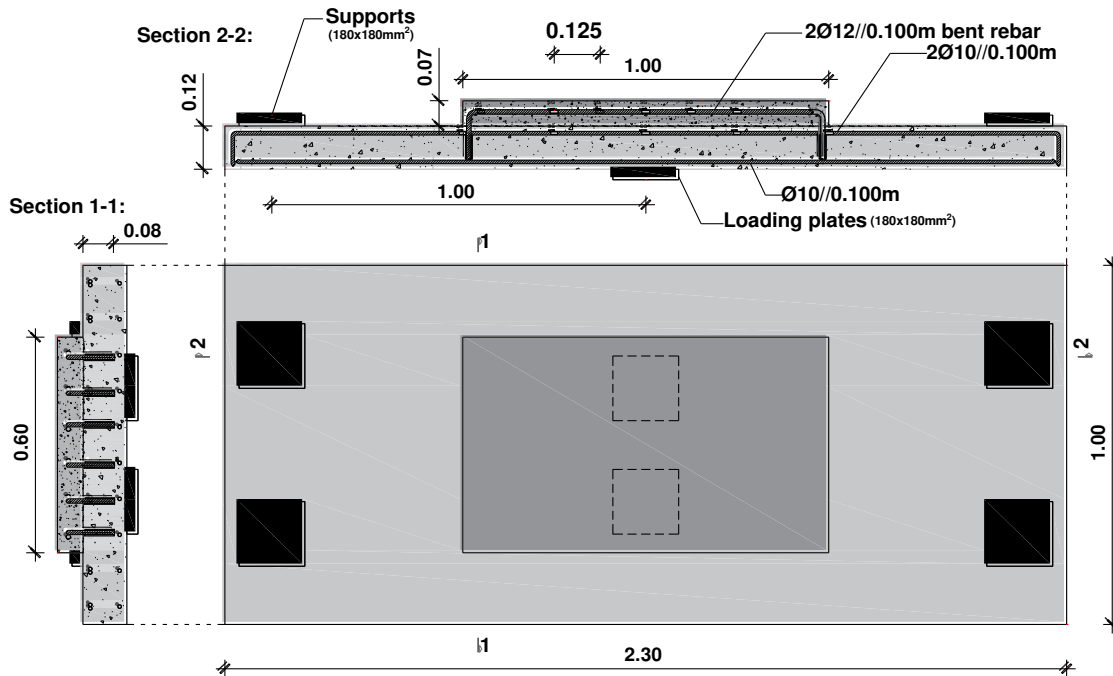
Rebar detailing and strain gauge placing for the  $R_s$ -ANC specimens.
